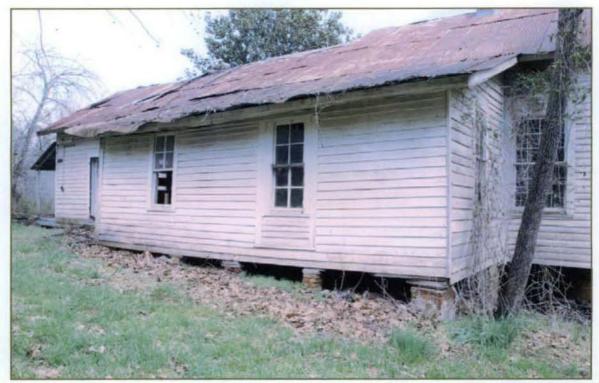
House, View #8, West Elevation, Detail of Shed Extension, Camera Facing Northeast
